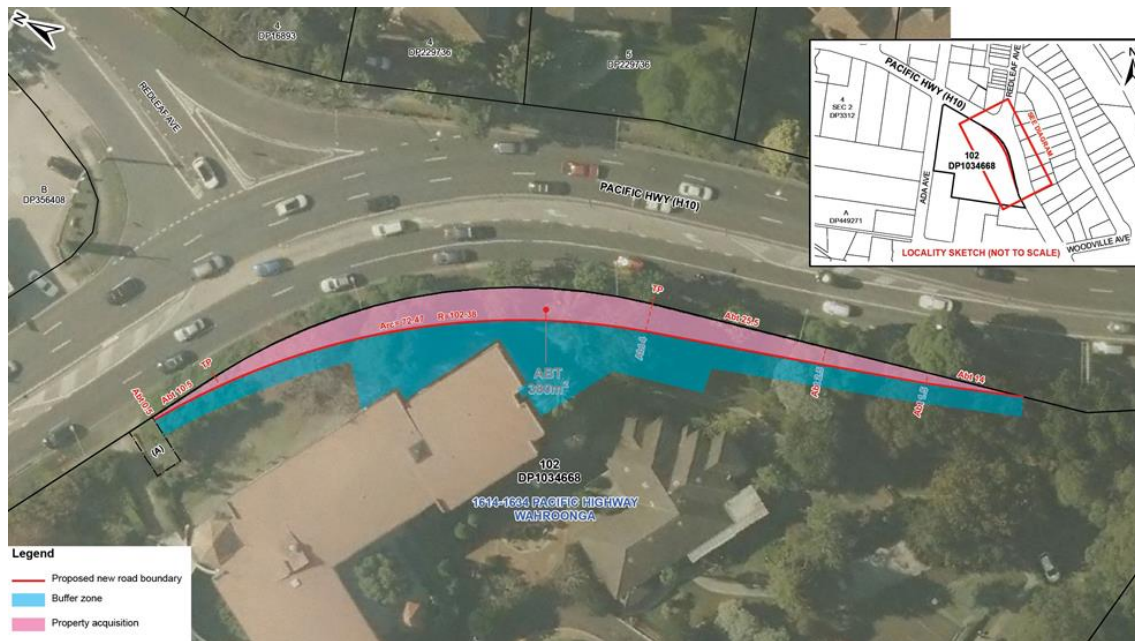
Area of former Estha site [15] showing the impact area and buffer zone resulting from the proposed works for Pacific Highway at Coonanbarra Road and Readleaf Avenue, Wahroonga
